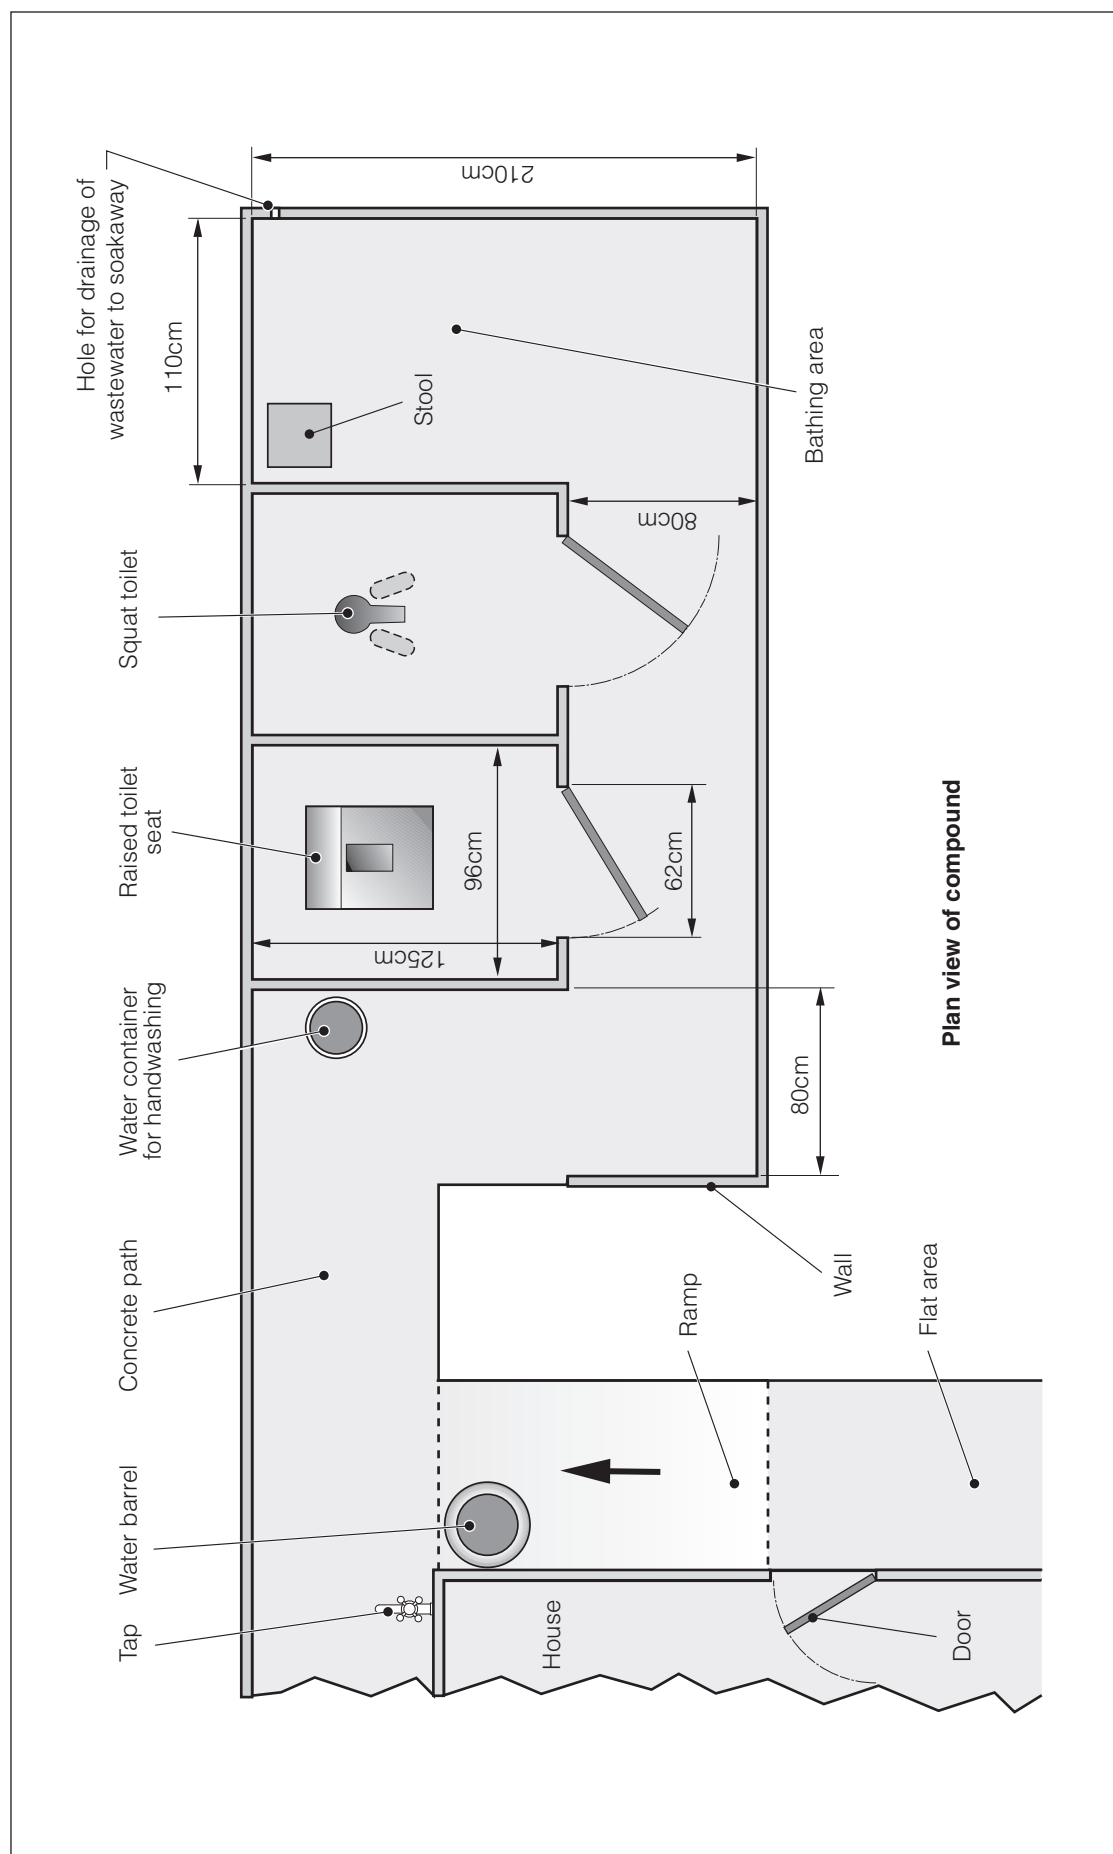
Layout of the Kiyaga family's toilet and bathing area.
